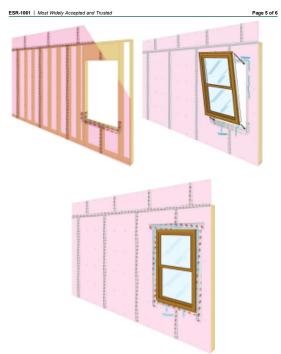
TYPICAL WINDOW FLASHING DETAIL
